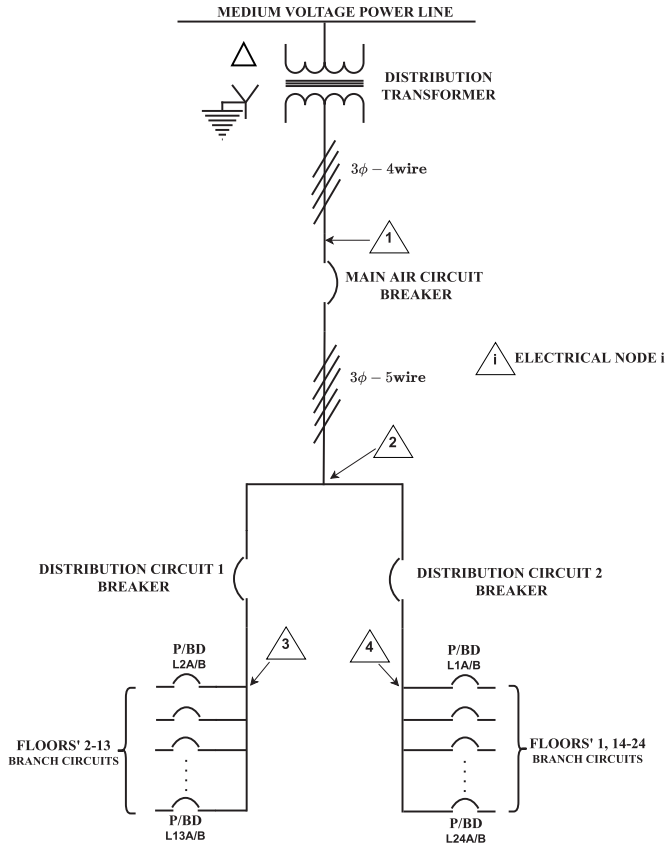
Electrical circuit diagram of a 24-floor apartment building on the MIT campus.
